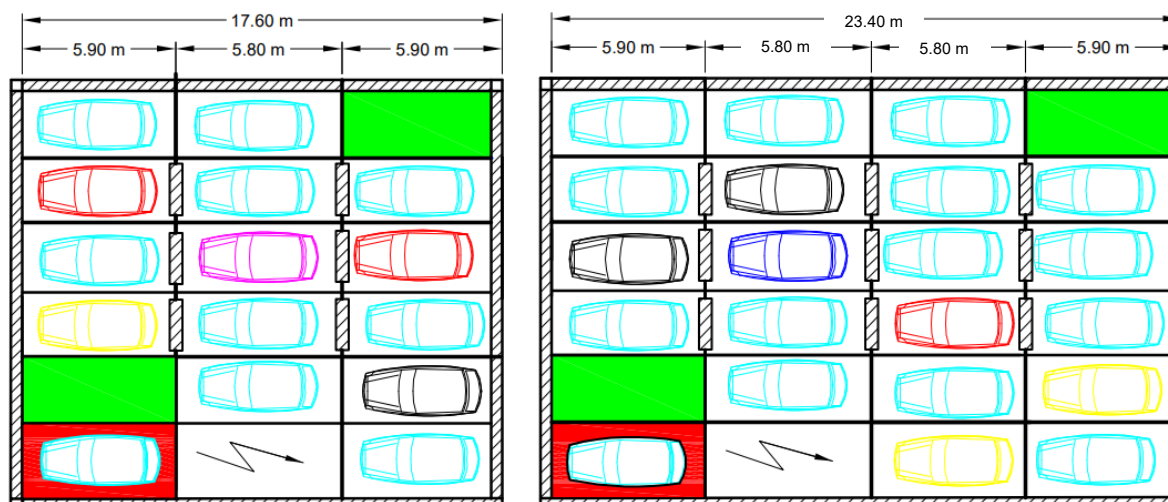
ARRANGEMENT SHOWING MULTI ROW ARRANGEMENT IN PLAN
